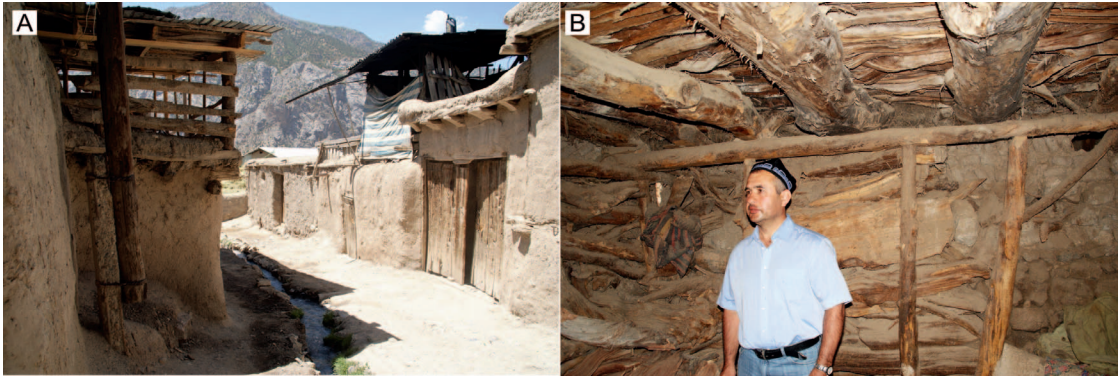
“Cottage #1” site. (A) The farmyard forms a string of buildings closed from the path; note small additional storey on right. (B) The interior of residential house, exposed beams of juniper wood.
